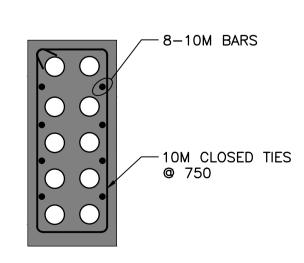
# DETAIL - OUTER WALL REINFORCEMENT LAP SPLICE
